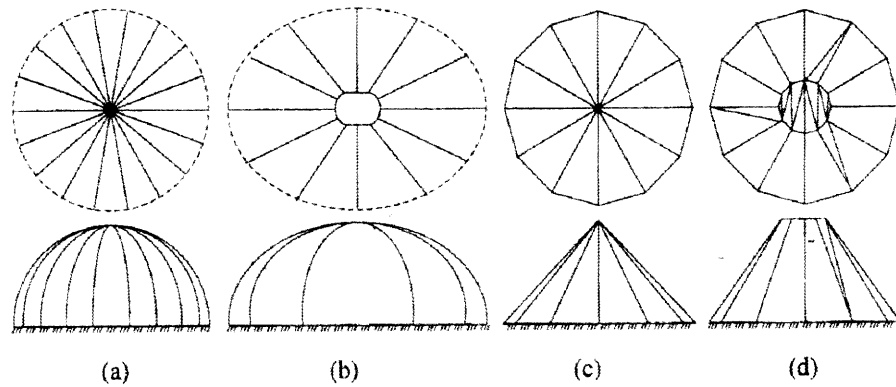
Typical Braced Rib Dome Configurations (Narayanan, 2006)
